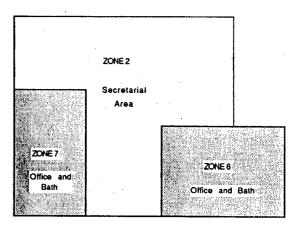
b General Floor Plan of the Prototype Converted Office Building (First Floor)
